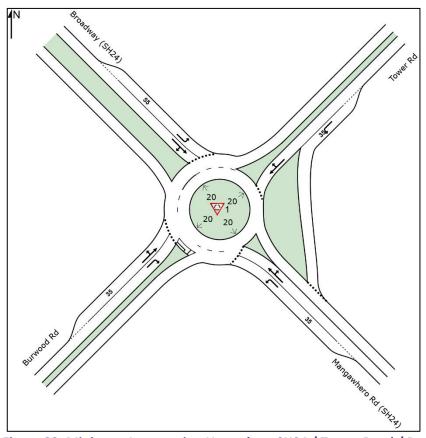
Minimum Intersection Upgrade at SH24 / Tower Road / Burwood Road Roundabout
